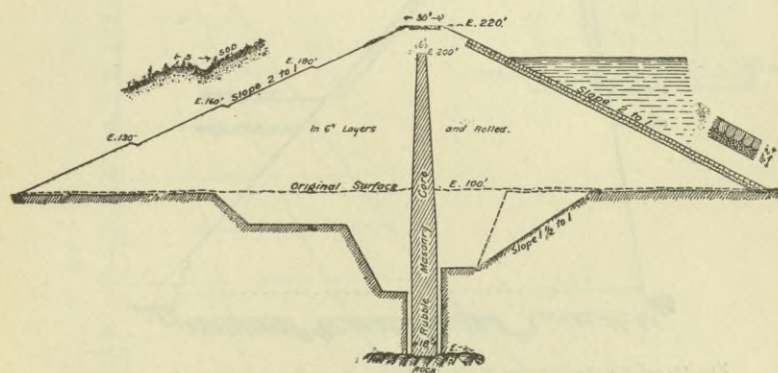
CROSS-SECTION OF EARTH EMBANKMENT. NEW CROTON DAM, CORNELL'S.
